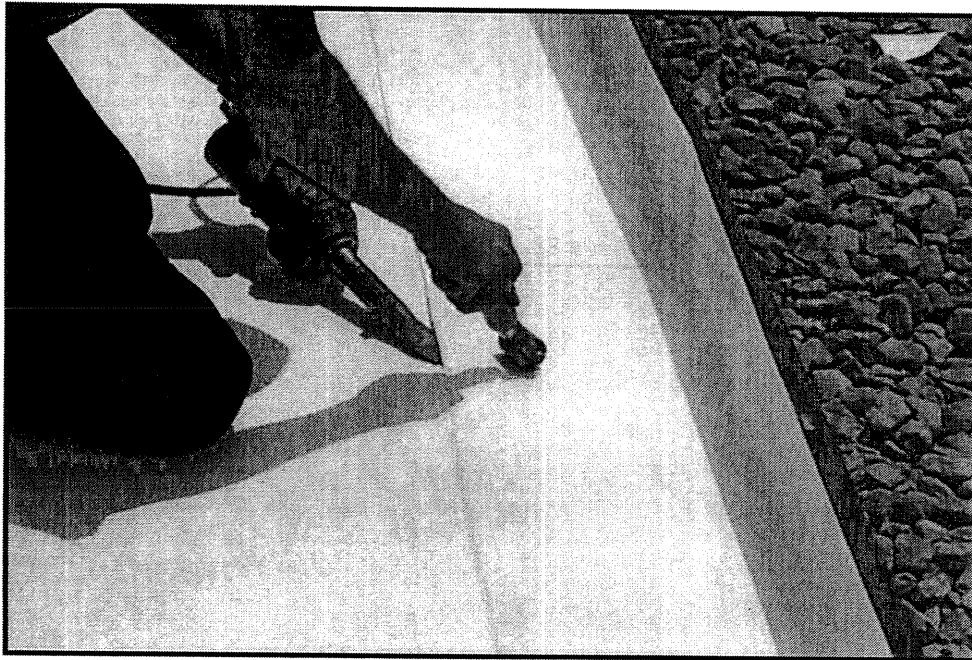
Membranes made of similar material were fastened using standard low-slope roof practice.
